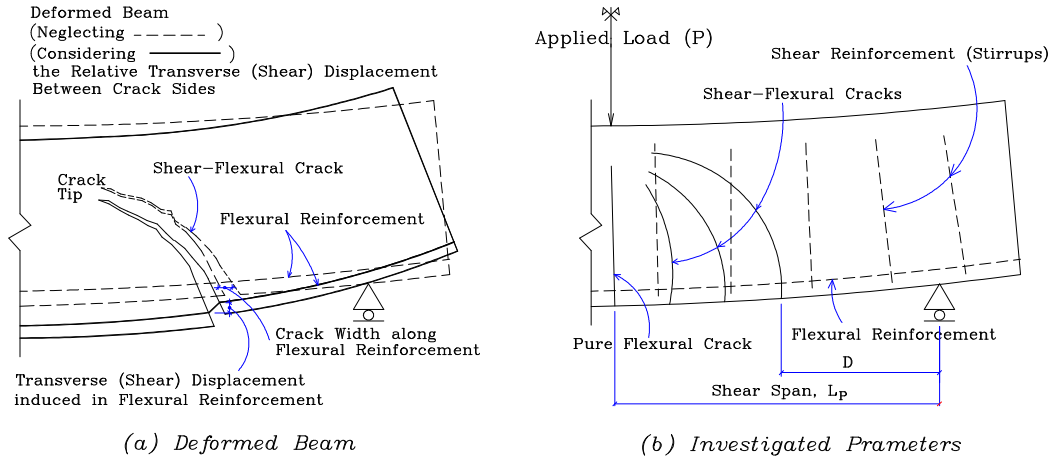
Partial beam elevation for deformed shape and investigated parameters.
